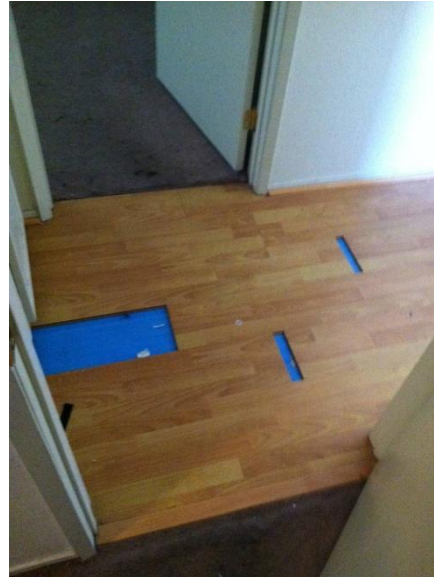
Damaged flooring in Unit 7 (similar, although less pronounced, conditions exist in other units)
